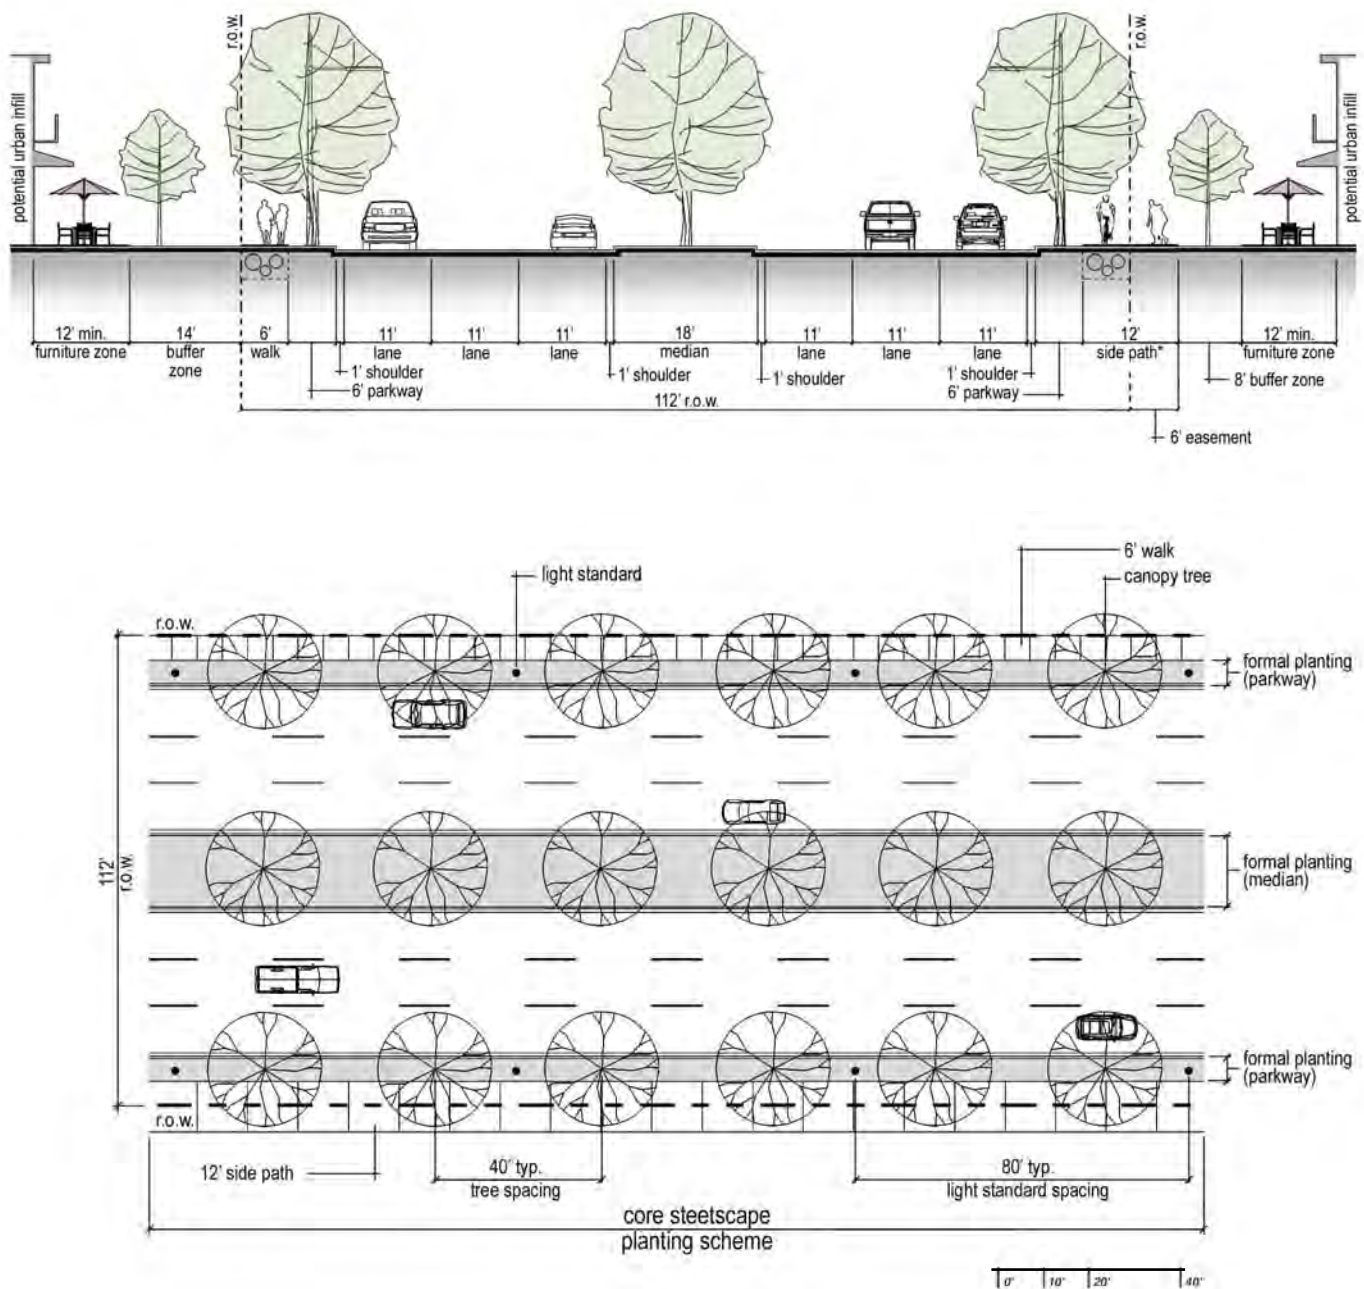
Typical Core Arterial Section & Plan: Principal Arterial
